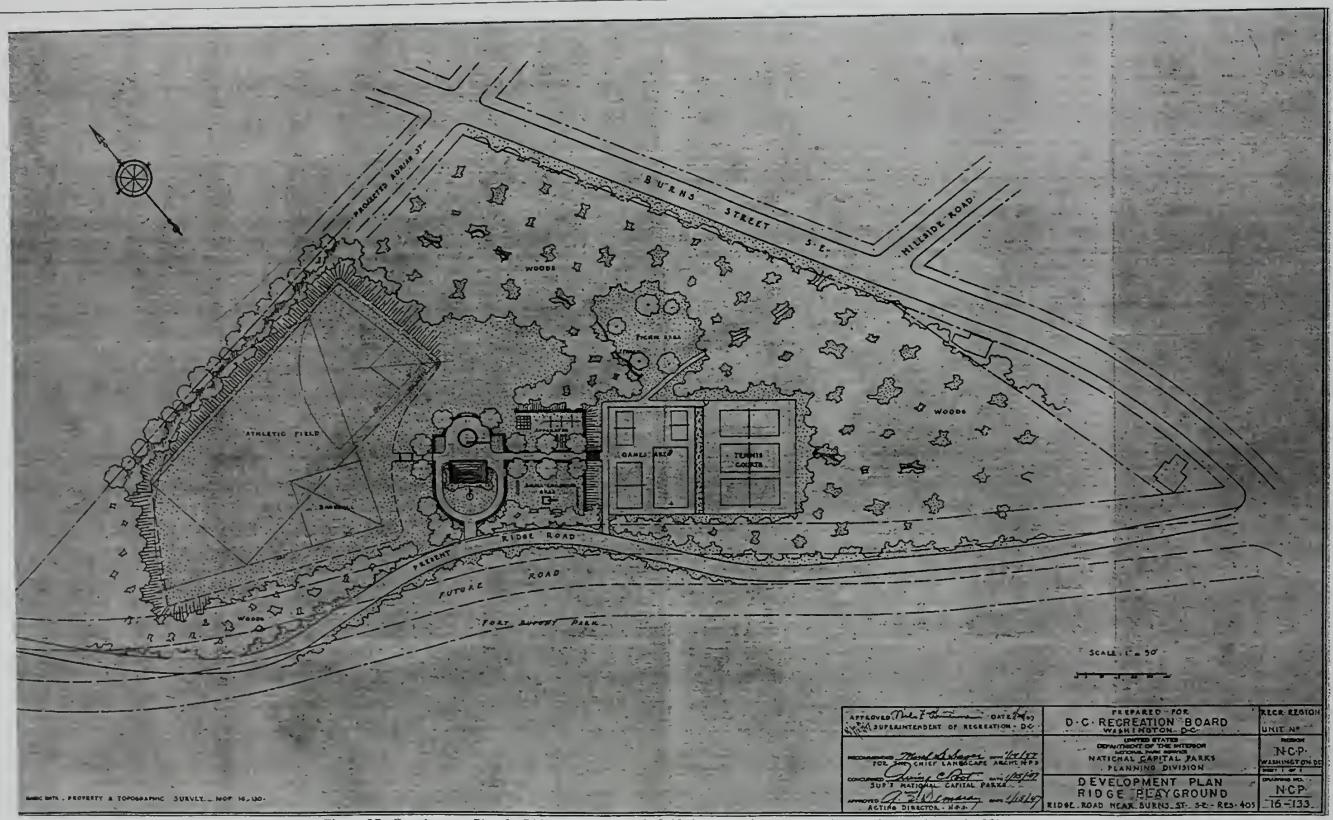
Development Plan for Ridge Playground, 1947 (National Archives, Record Group 79, Drawing #16-133).
